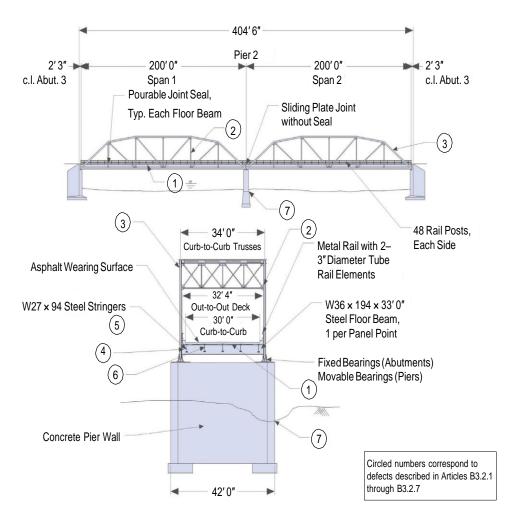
Elevation and Typical Section of Bridge for Example B.3
